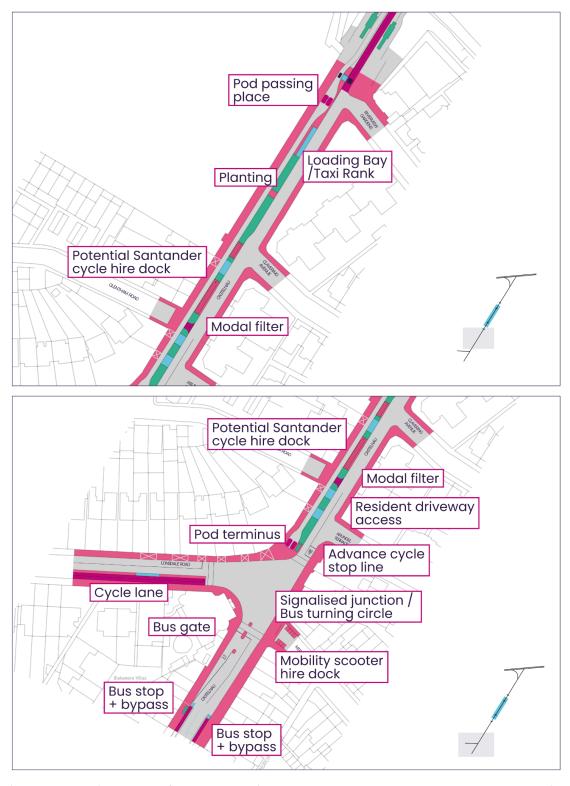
B: Site plans for remodelling the road layout around Hammersmith Bridge.
